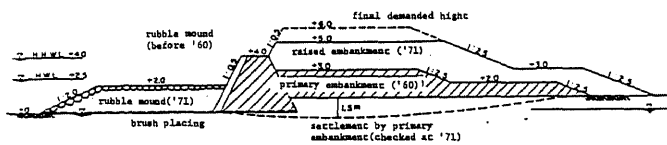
Profile and Earthwork of the Embankment for Breakwater on the Ariake Clay Ground
